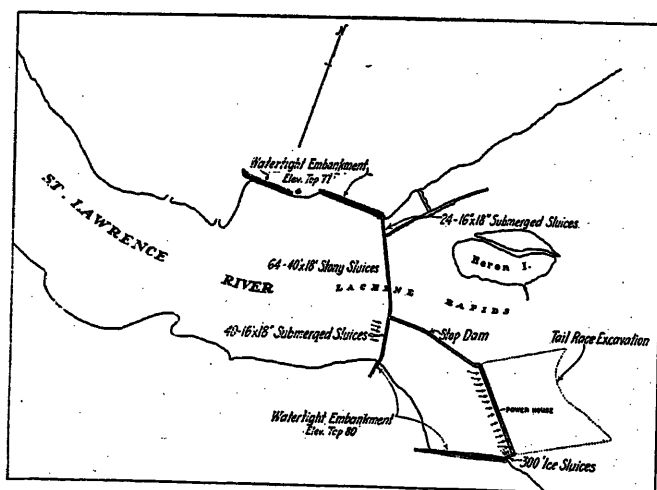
PROPOSED INSTALLATION AT FOOT OF LACHINE RAPIDS RECOMMENDED BY WOOTEN-BOWDEN REPORT
